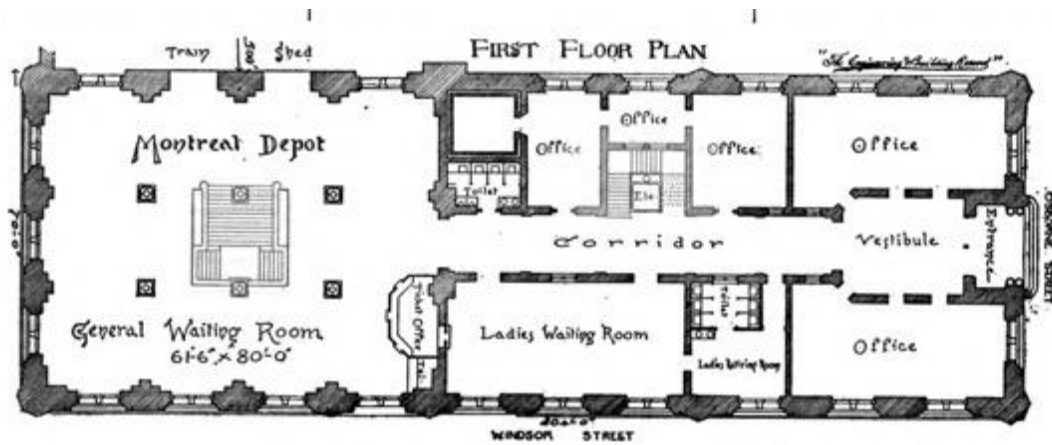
The first-floor plan of Windsor Station published in *The Engineering & Building Record* (n.d.). In the final plan, the office next to the ladies' waiting room was incorporated into the ladies' waiting room. *The Engineering & Building Record* 17, no. 6 (n.d.): 83.
